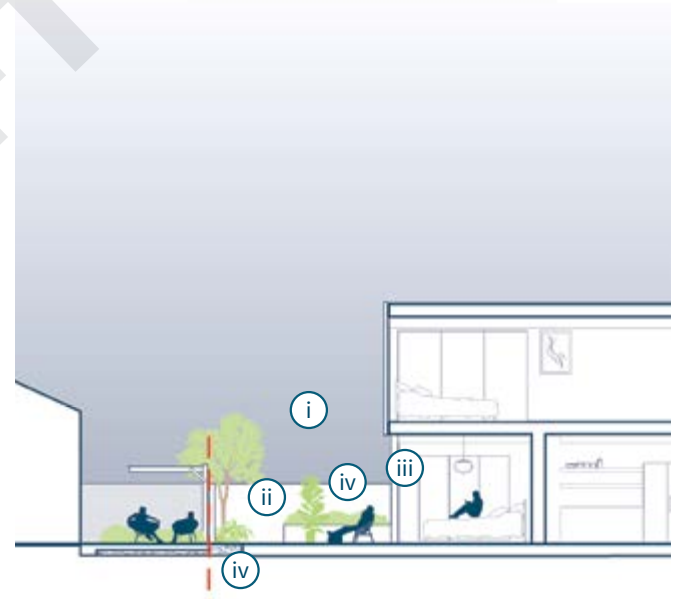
When private courtyards are located along the side or rear of the dwelling, higher fencing can improve privacy and allow for floor to ceiling operable doors.
